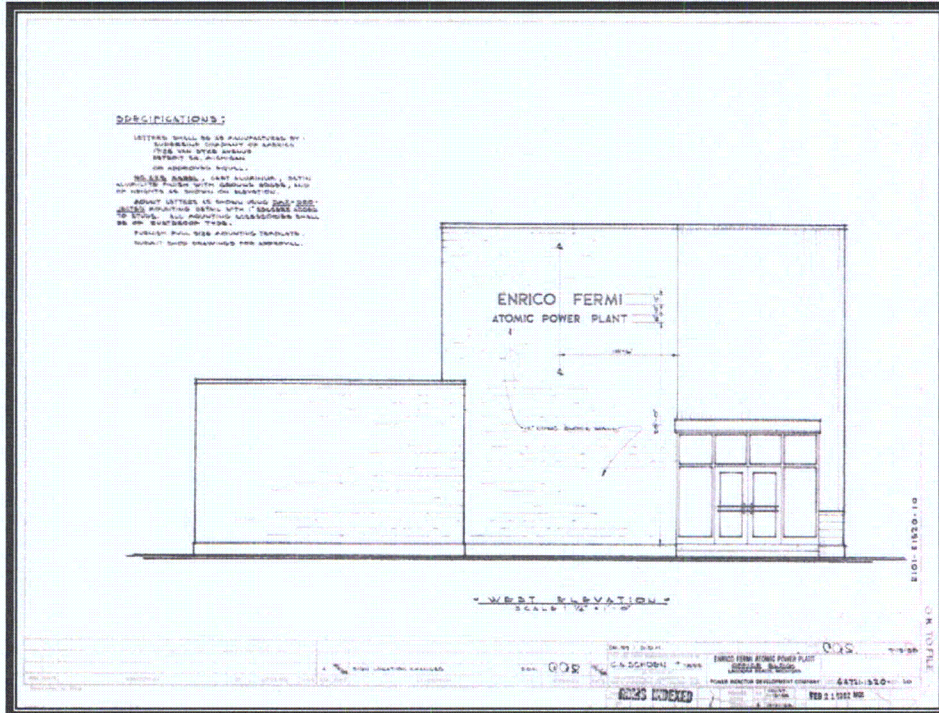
Elevation of west wall of office building (Courtesy DECo)
